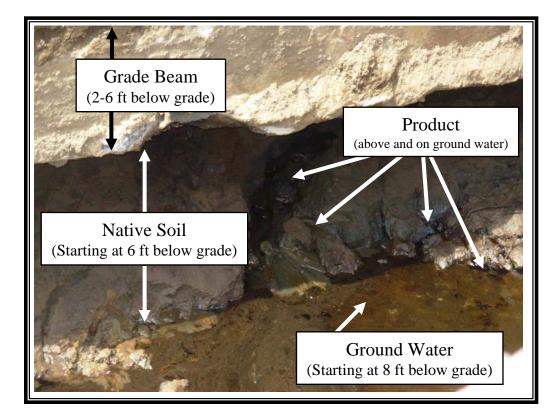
View of western wall of test pit TP-5, showing free-phase petroleum below grade beam.
